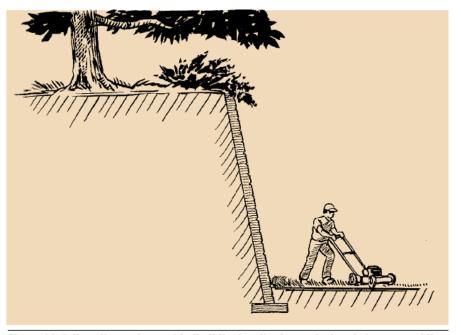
Crib walls can be used to limit the length of manufactured slopes, providing more room for trees and development.
